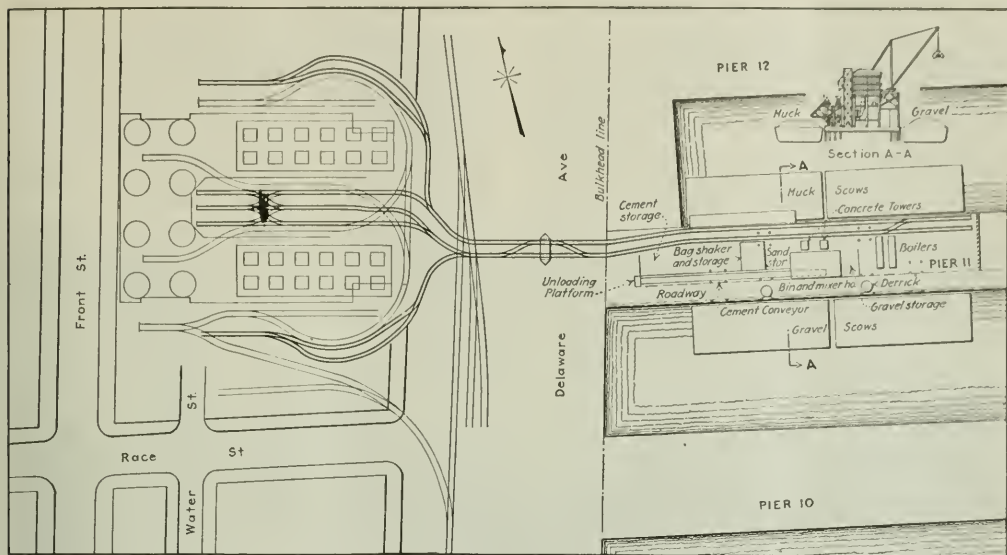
DETAIL PLANT PLAN FOR PHILADELPHIA ANCHORAGE
